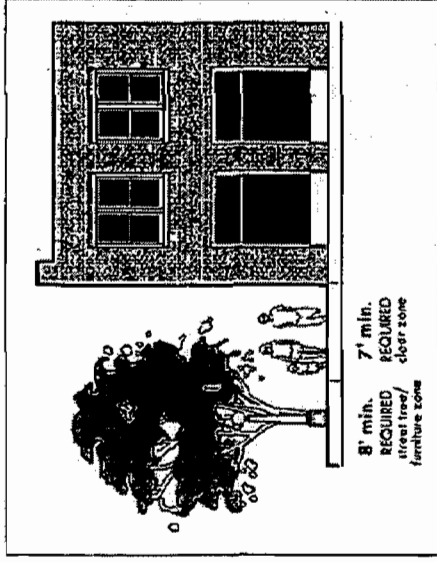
Sidewalk Requirements in TOD Mixed Use District. Street trees are required in this District with an average spacing not greater than 30 ft on center.
